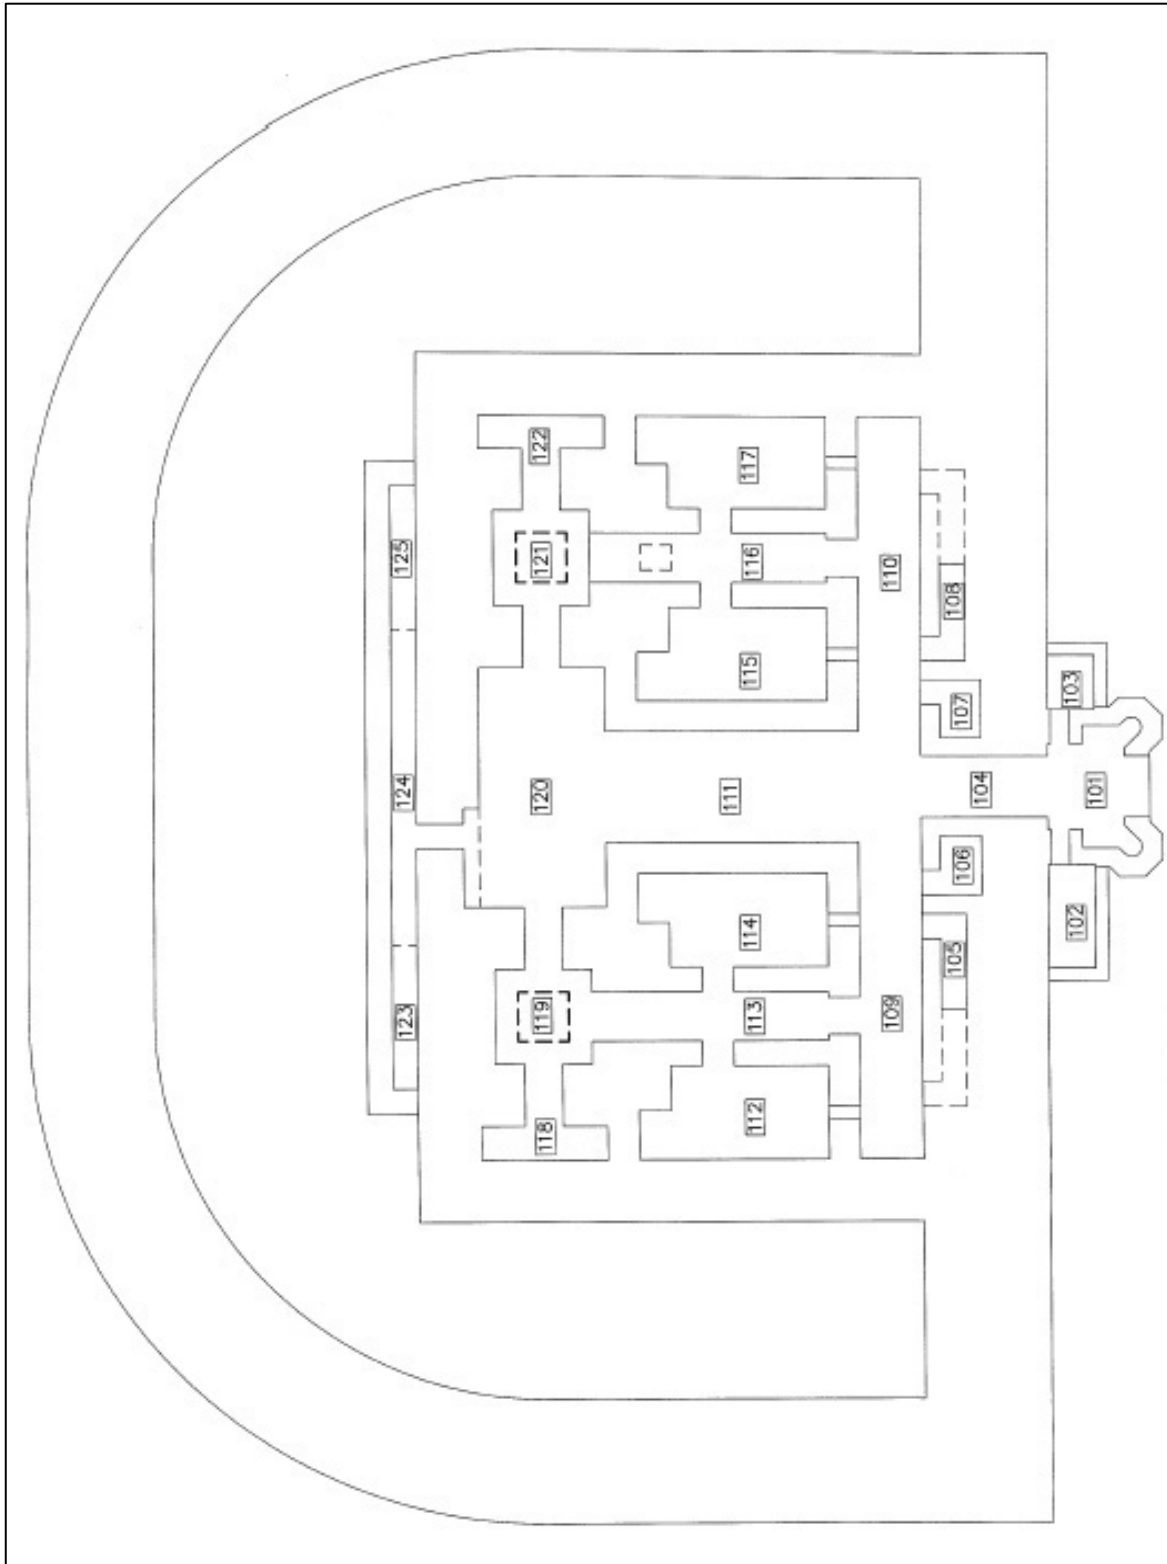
Battery Potter, first-floor plan with room numbers. Not to scale.
